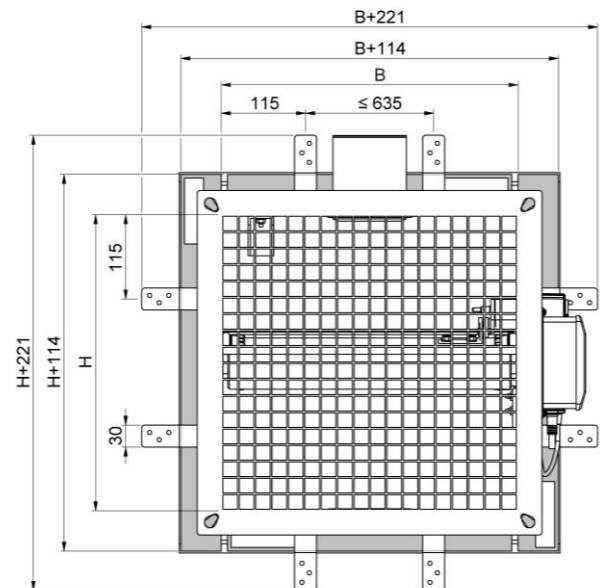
BKA-Ü with installation frame type ER-A1 and shown fixing lugs (in the figure: width (B) x height (H) 400 x 400 mm)
